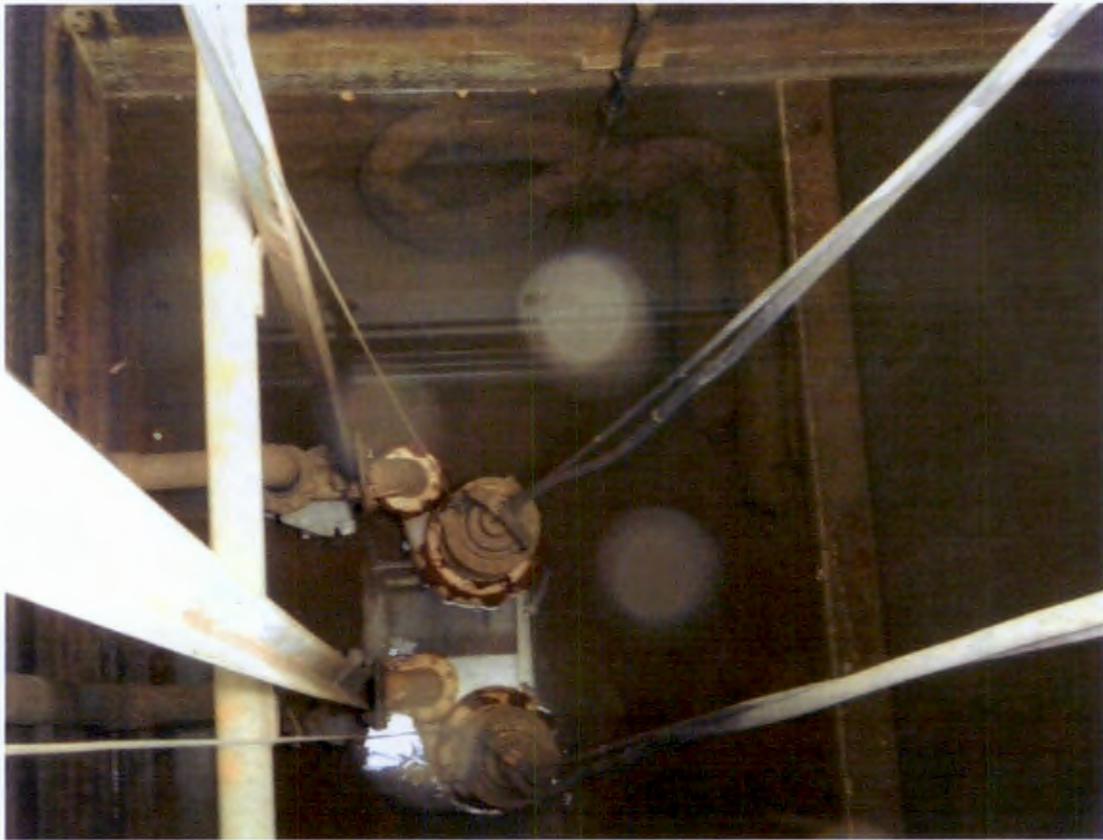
342 Collection Sump vault floor, looking south, August 2014.
